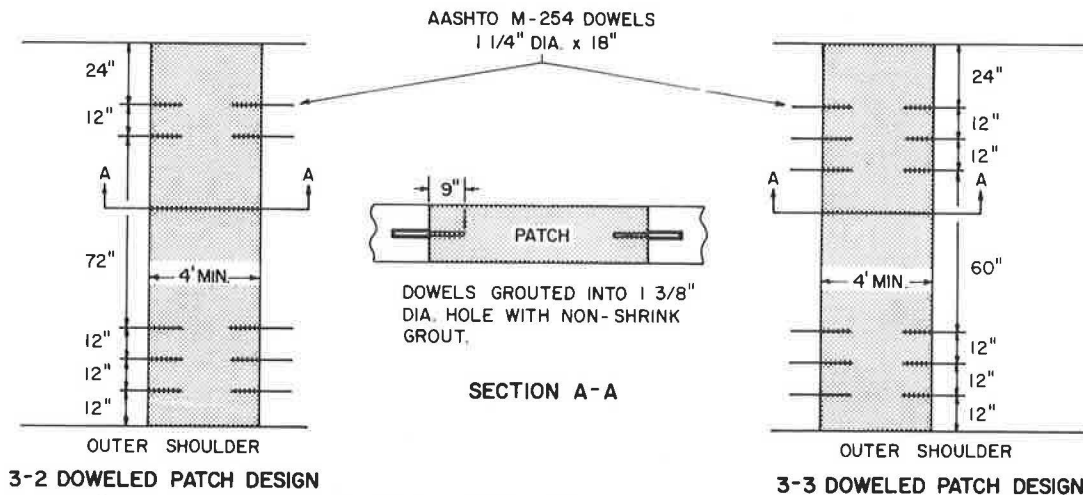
Patch design details of 3-2 and 3-3 patches.
